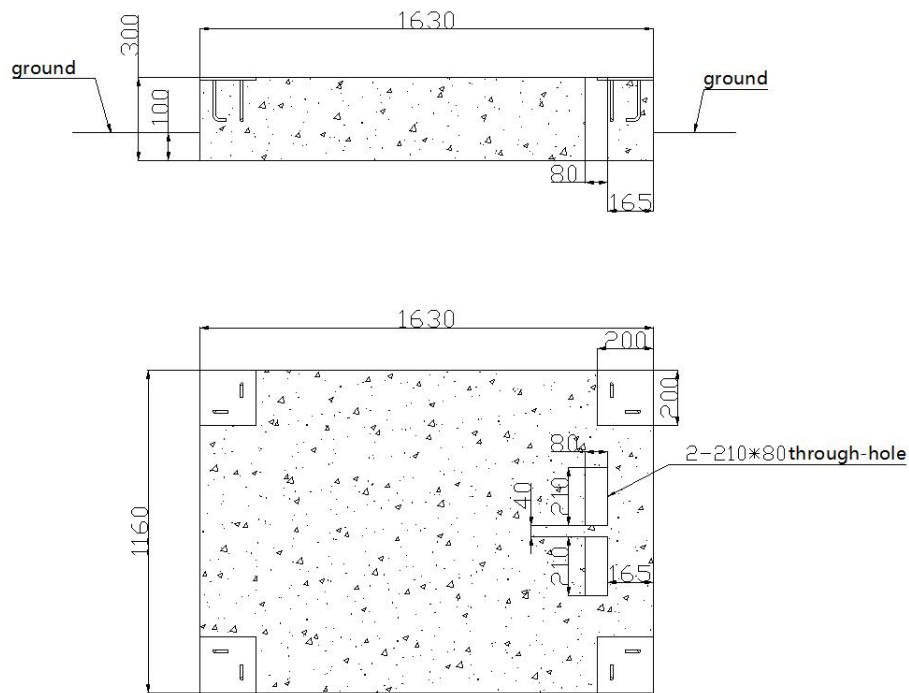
Equipment foundation drawing (unit: mm)
